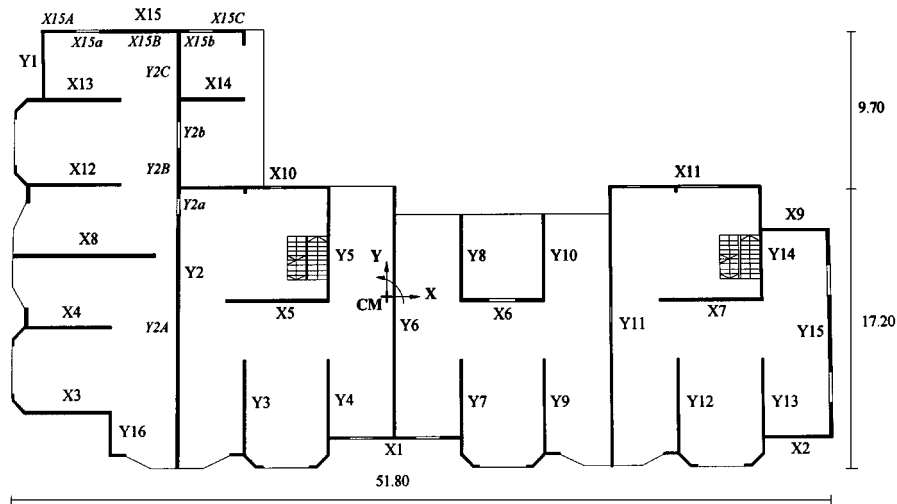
Plan of the 21-storey reinforced concrete building. Within a coupled wall, walls are denoted by *A*, *B* and *C*, and beams are denoted by *a* and *b
